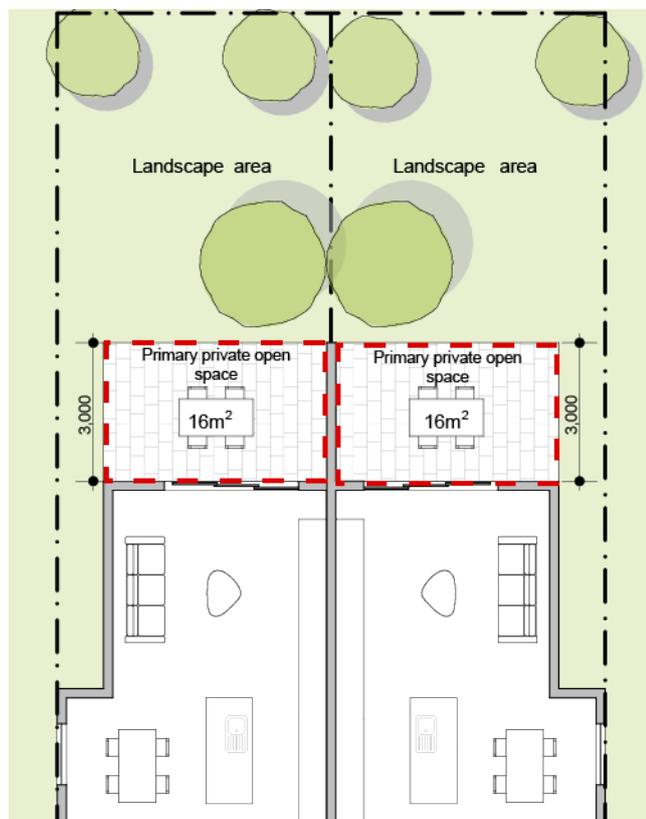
This combined kitchen-dining-living room opens directly on to the balcony. Private open space must meet the required minimum dimensions and must be paved.
